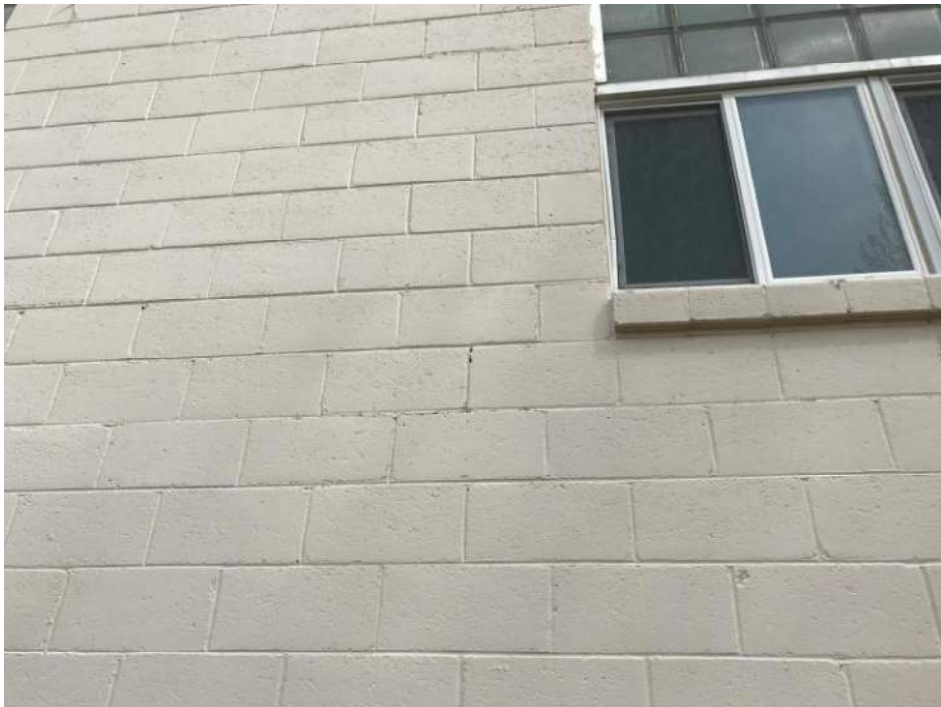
Cracking in Exterior Wall Along Mortar Joints (1956 Addition)
